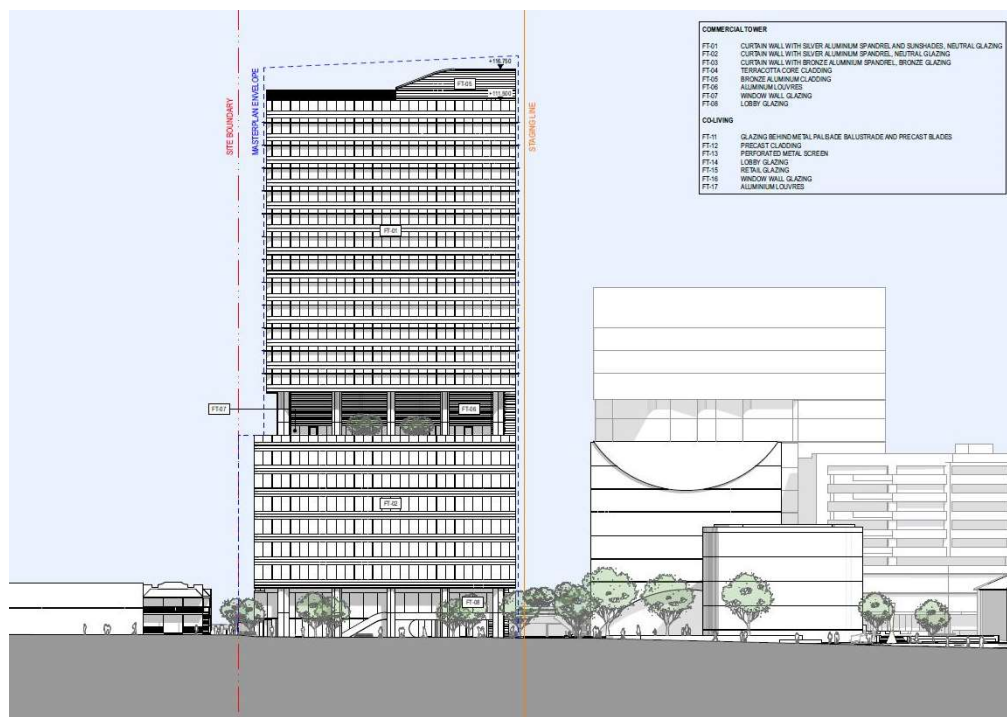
Northern elevation of the commercial building showing the articulation of the Level 6 and 7 terrace and the stepped roofline. This image also clearly shows the two-storey podium setback at ground level. (Source: FJMT Architects)
